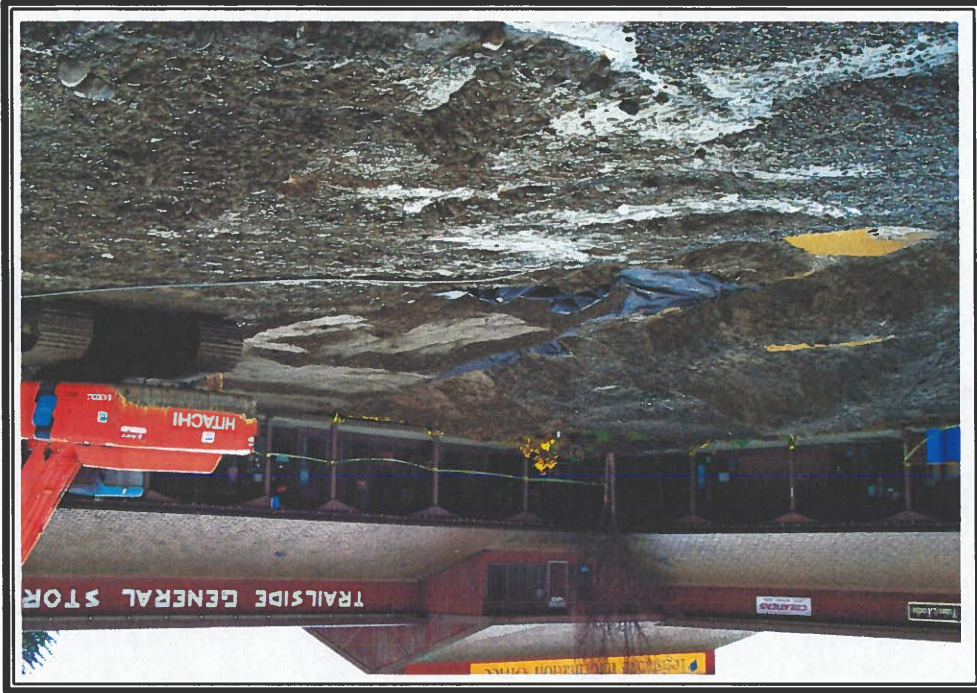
Construction of temporary drive to soil storage area behind TGS.
